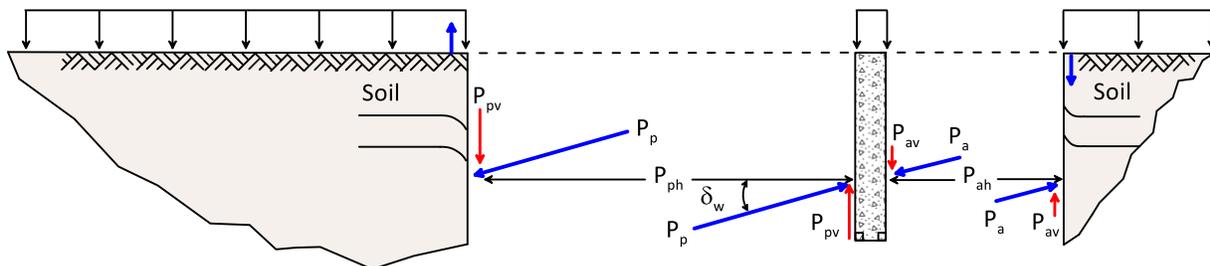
Orientation and sign convention for active and passive forces and wall friction
